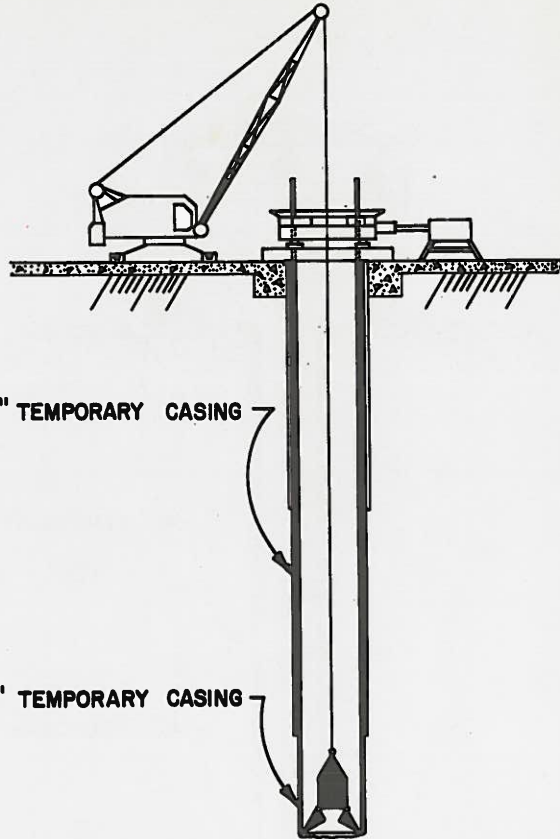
CASING DRIVER FORCING 41-INCH CASING AS EXCAVATION CONTINUES TO BEDROCK
